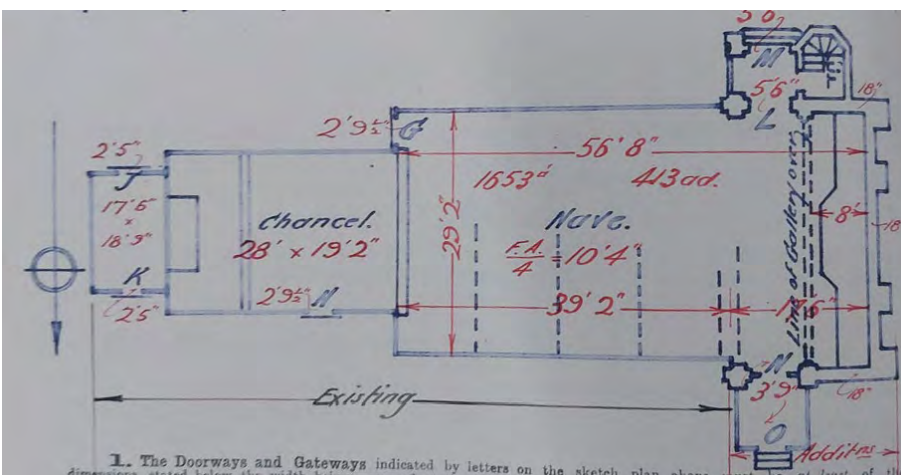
Plan showing the new brick narthex (at right) to the existing timber church (at left), plan dated March 1925
